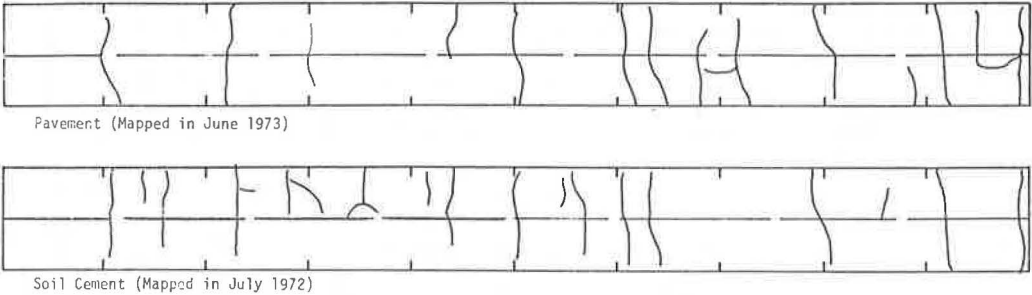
Cracking pattern of soil-cement base and superimposed pavement for experimental section with lime additive (two mixings).
